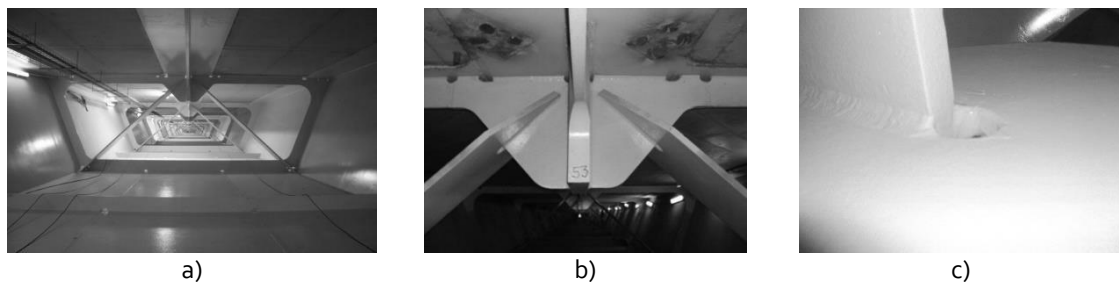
Alcácer do Sal bridge box girder: a) inside view with reinforcing diaphragms; b) local view of the connection between the diagonal and the hanger gusset; c) welded connection investigated between the gusset the diagonal.
